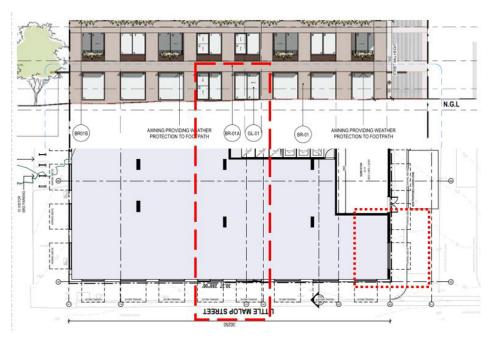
Elevation and floor plan of Little Malop Street and floor plan of Board place
